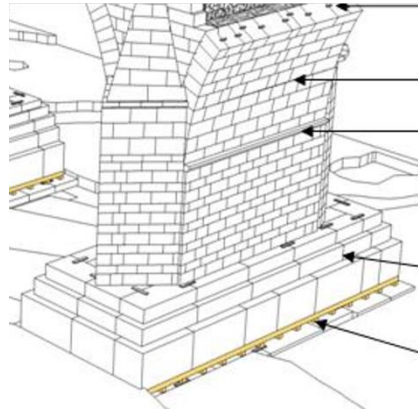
Application of wooden grid under a singular foundation (A Project, 2009)
